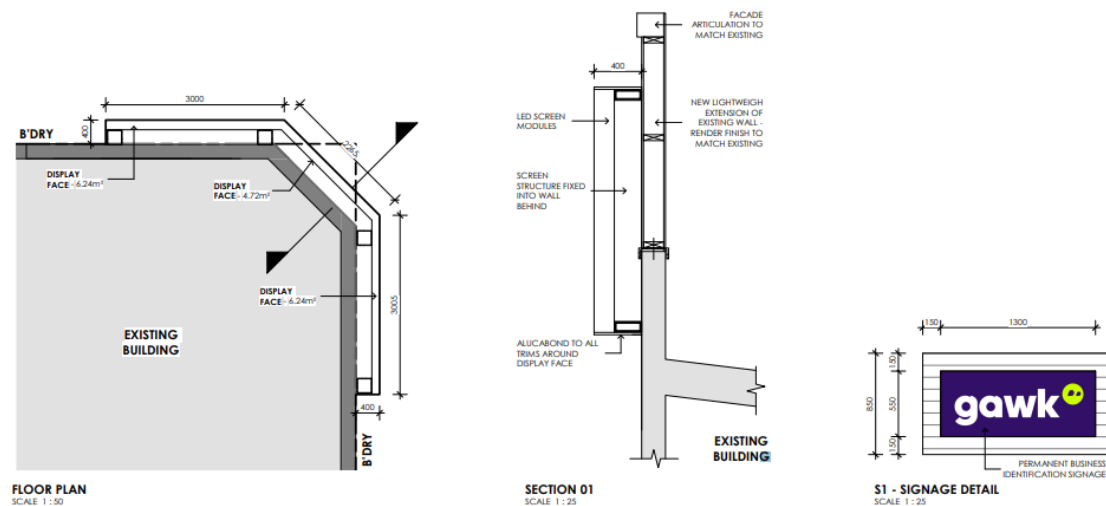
Floor Plan and Section Plan of proposed electronic promotion sign, and details of promotion sign.
